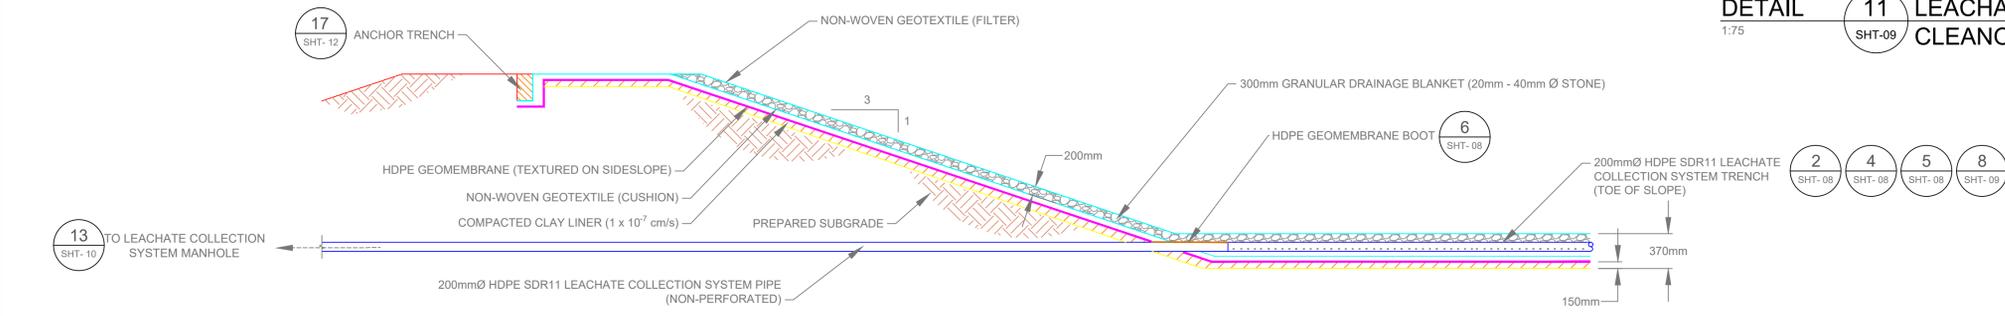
LEACHATE COLLECTION SYSTEM CLEANOUT RISER PIPE ON SIDESLOPE
